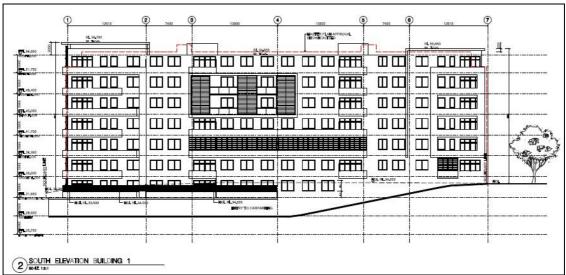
Southern elevation of Building 1, comparative height with concept plan shown dotted in red
